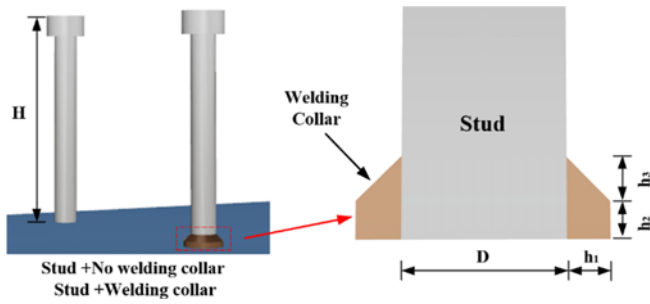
Parameters of Welding Collar Formed by Stud Welding
